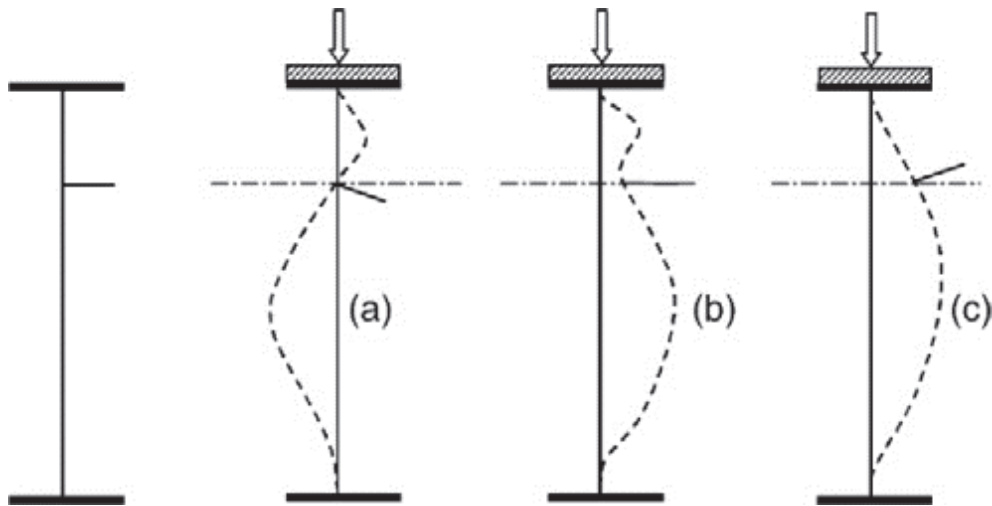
Failure mode types of girders with one longitudinal stiffener [2, p. 238].
